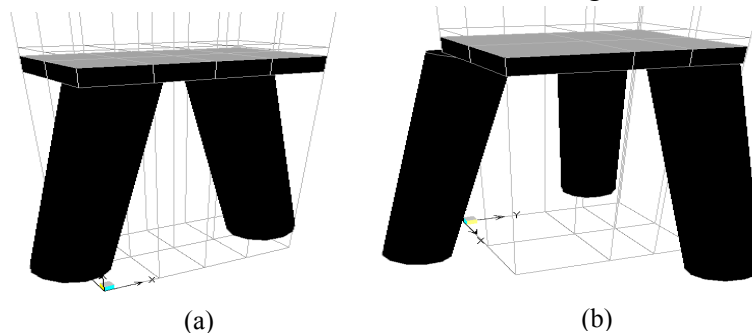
Pile cap models of (a) 2-Pile and (b) 3-Pile system.
